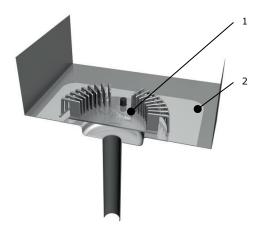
Example of installation of a roof inlet with plate in a metal gutter
